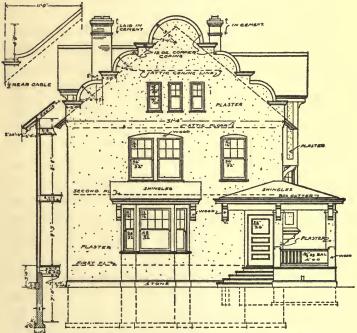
Front Elevation of a Residence at Champaign, Ill.
